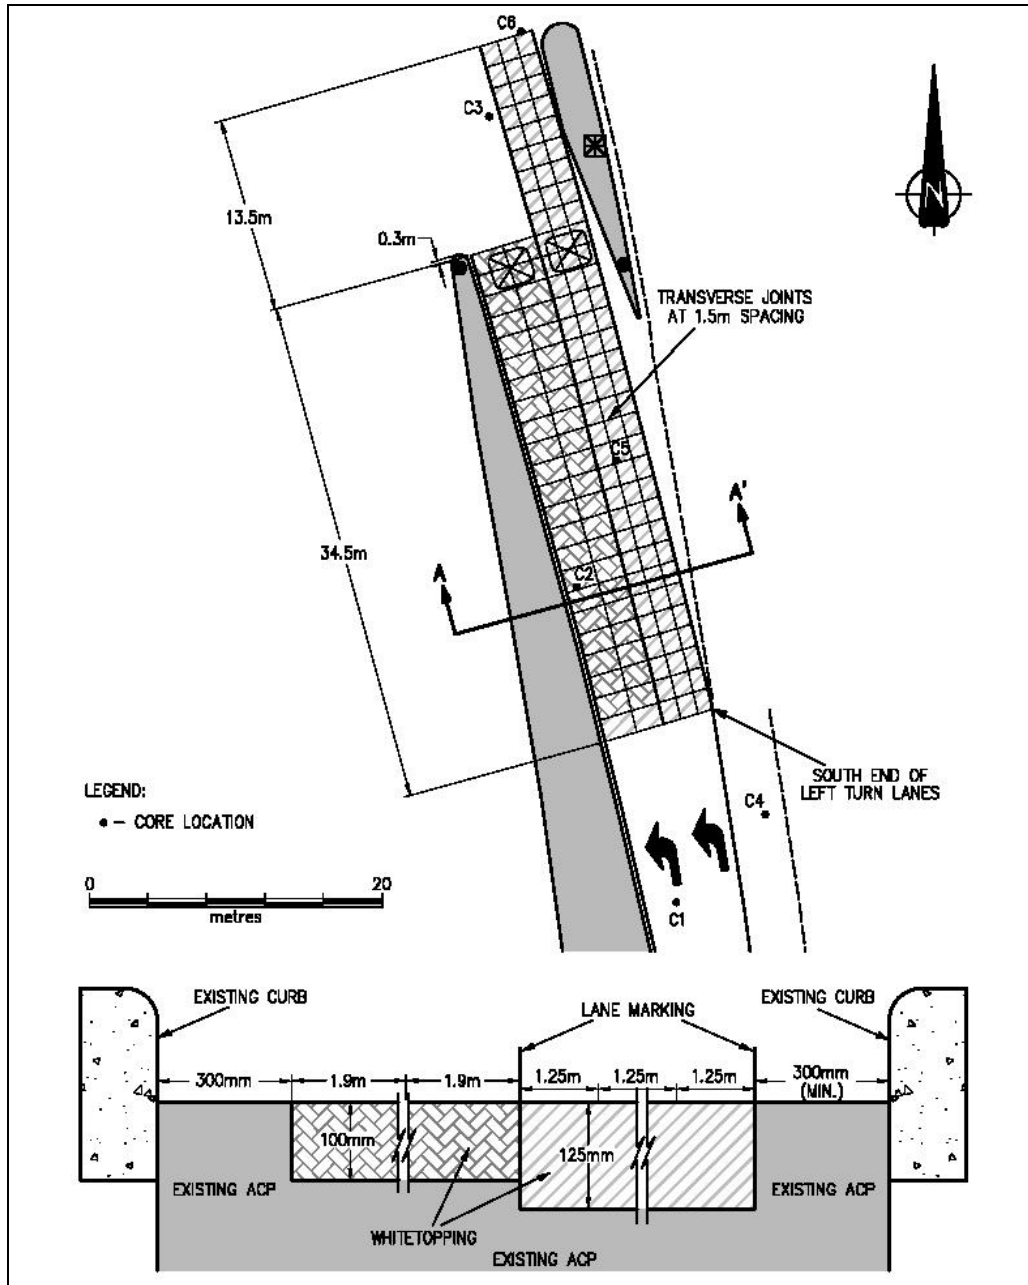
Bonded Concrete Overlay Initial Core Locations and Design Details
